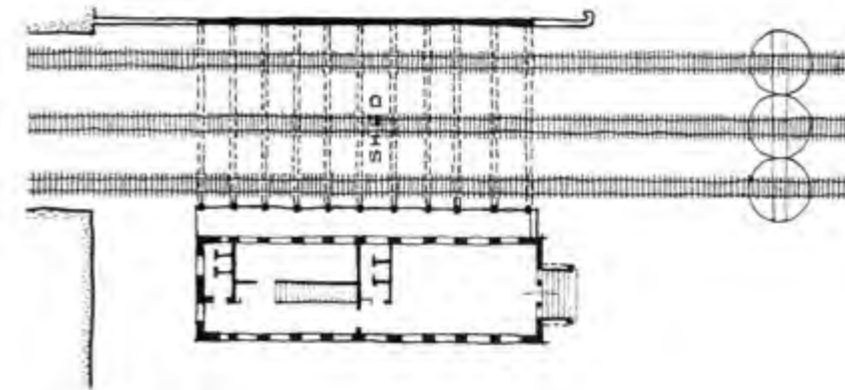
Plan of Crown Street station. The station building and the adjacent train shed are evident.
